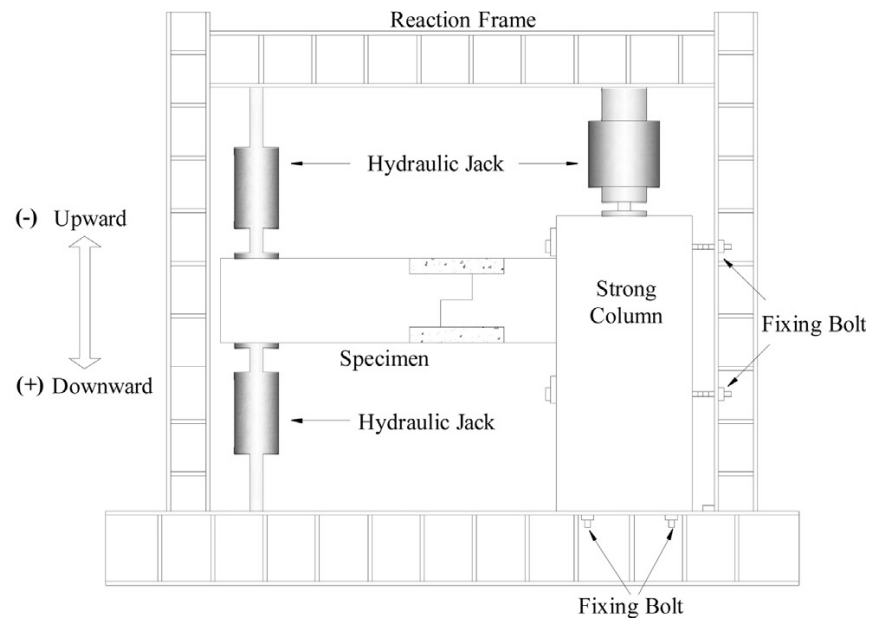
Test set-up used [45] (NB: the hydraulic jack at the left bottom corner was only used during cyclic testing)
